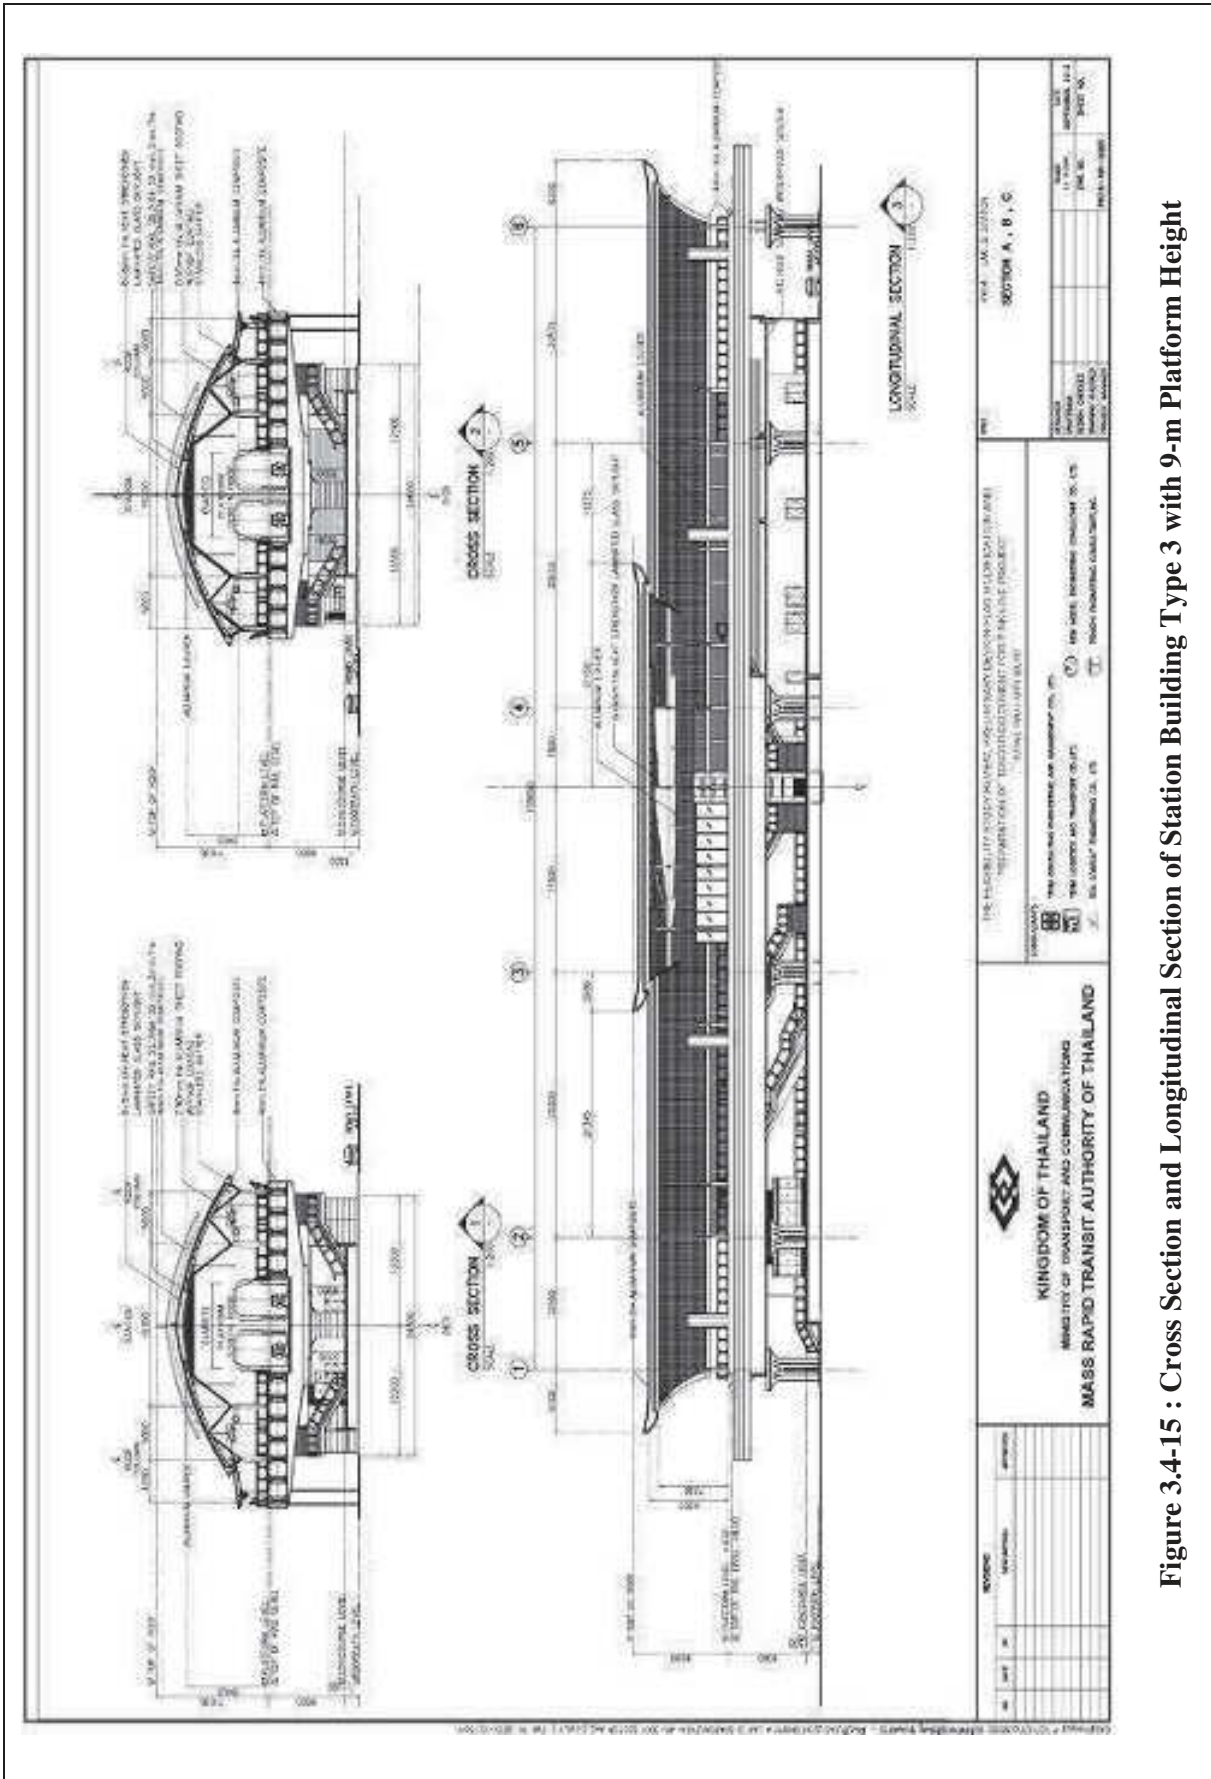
Cross Section and Longitudinal Section of Station Building Type 3 with 9-m Platform Height
